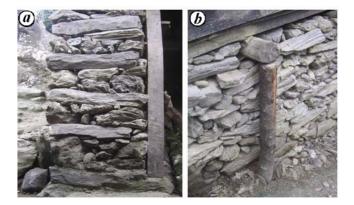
Cross-section of the stone masonry wall with mud mortar. a, 'Through stones' in stone masonry wall are vital in preventing the wall from collapsing. b, Bulging is more prominent in stone masonry walls because of the absence of 'through stones' and needs to be retro-fitted with wooden posts.
